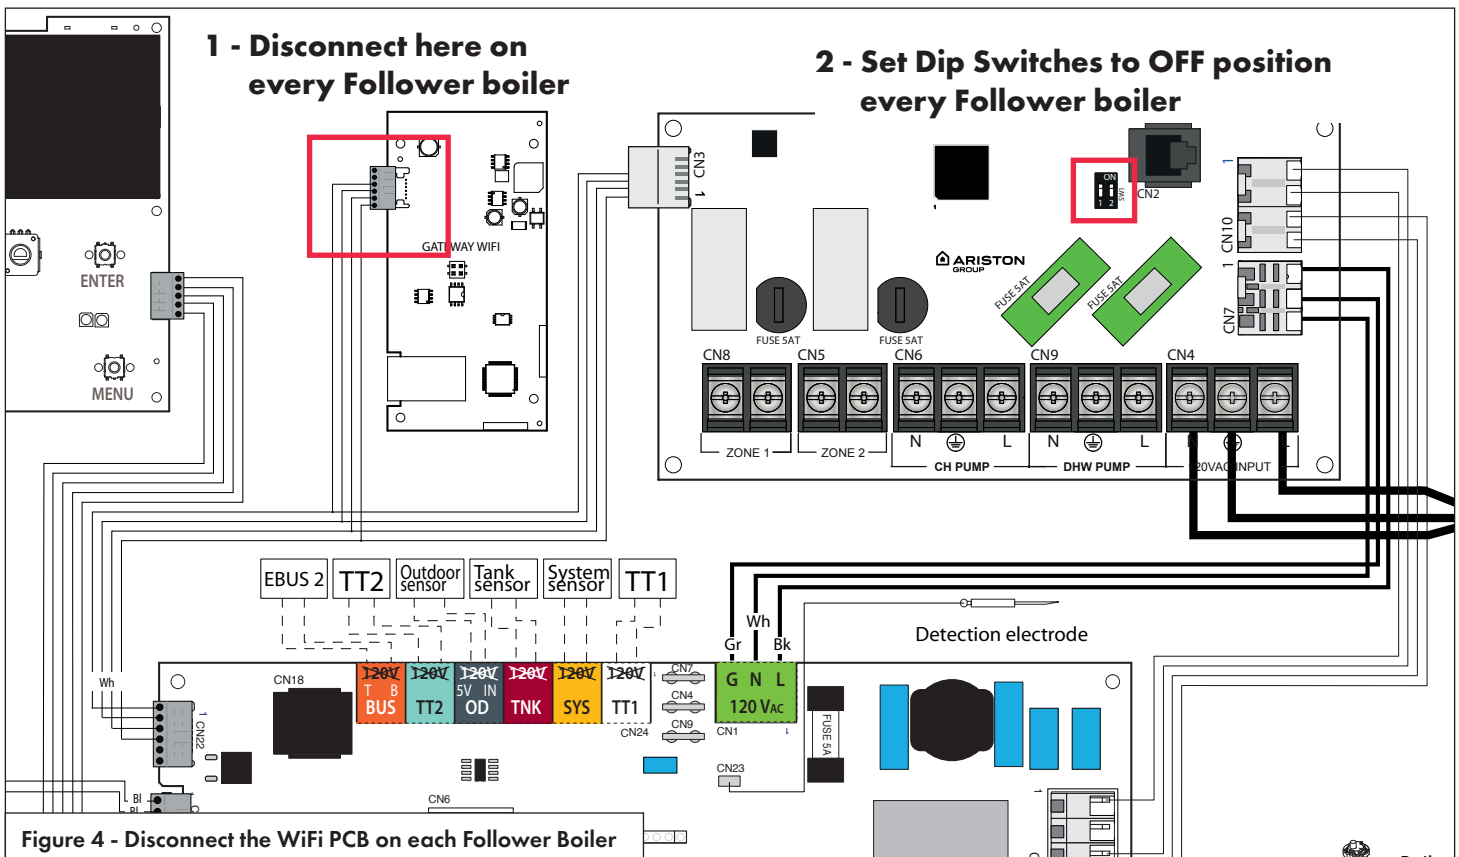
Disconnect the WiFi PCB on each Follower Boiler
